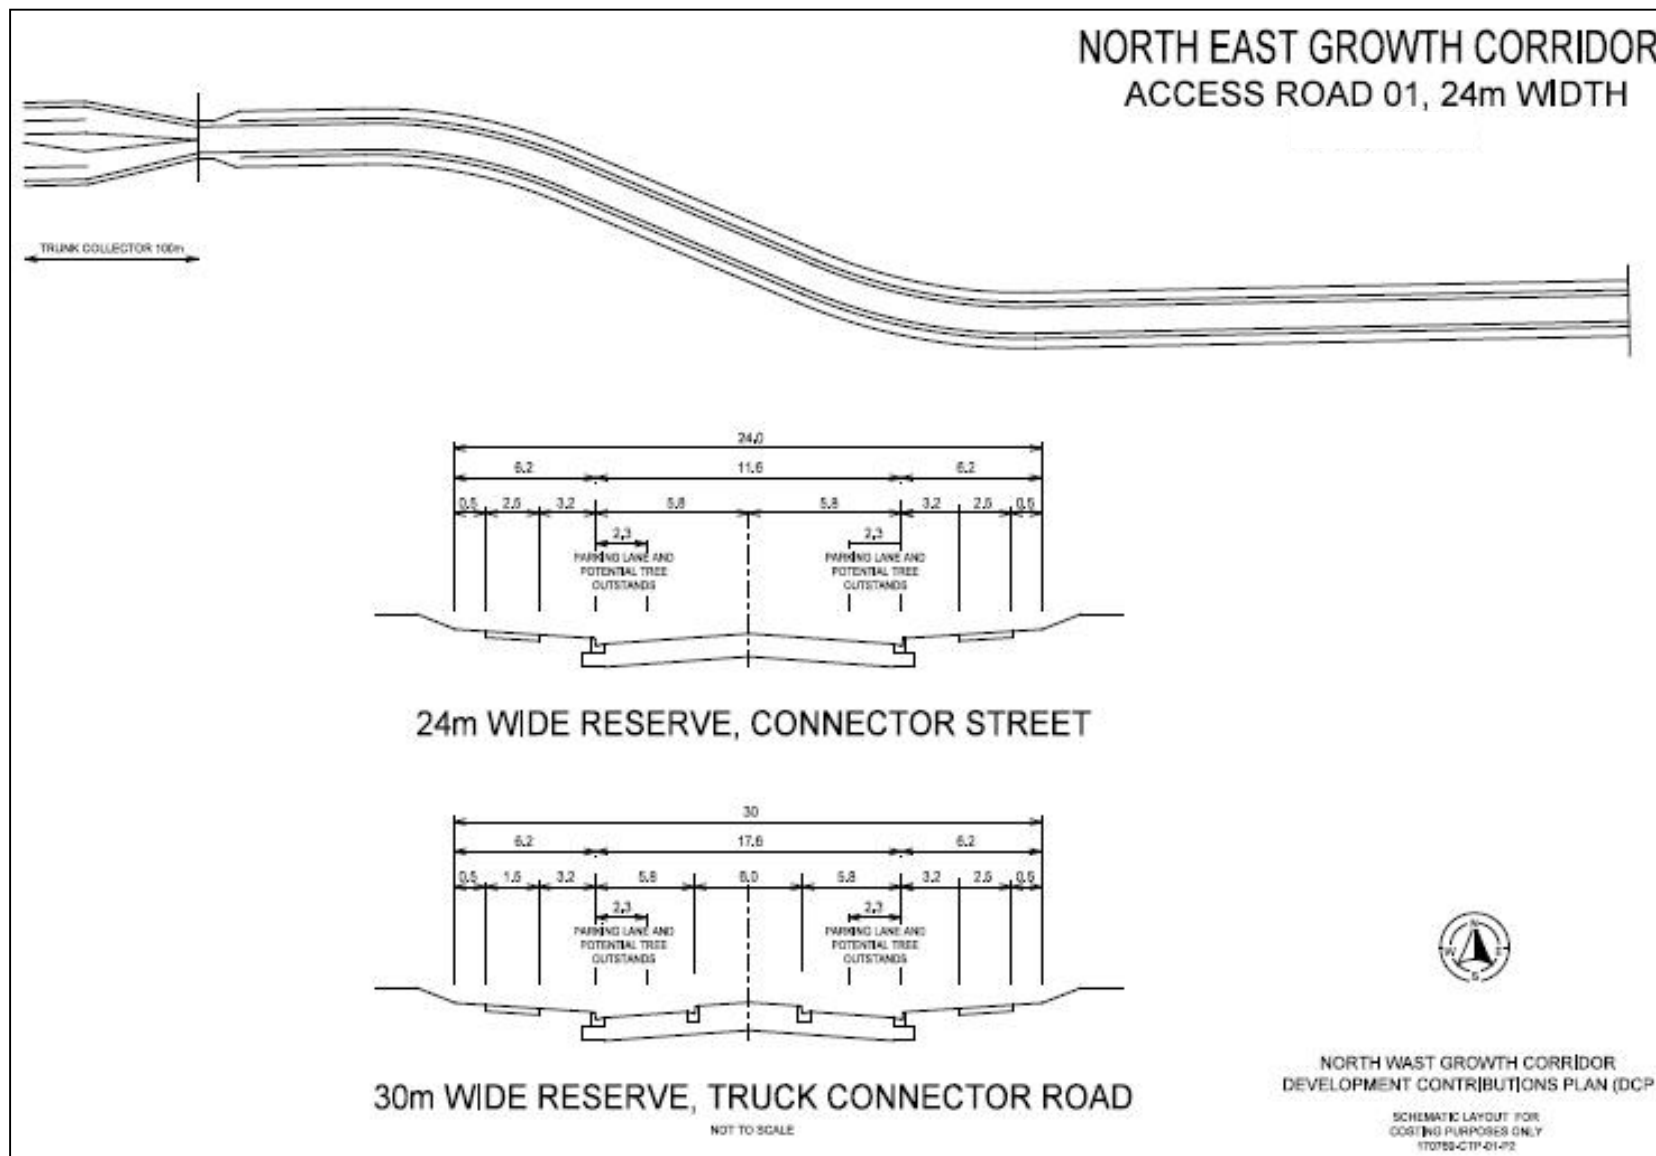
Typical Road Profile for Road-01 – Connector Street Level 1 with Trunk Collector terminal
